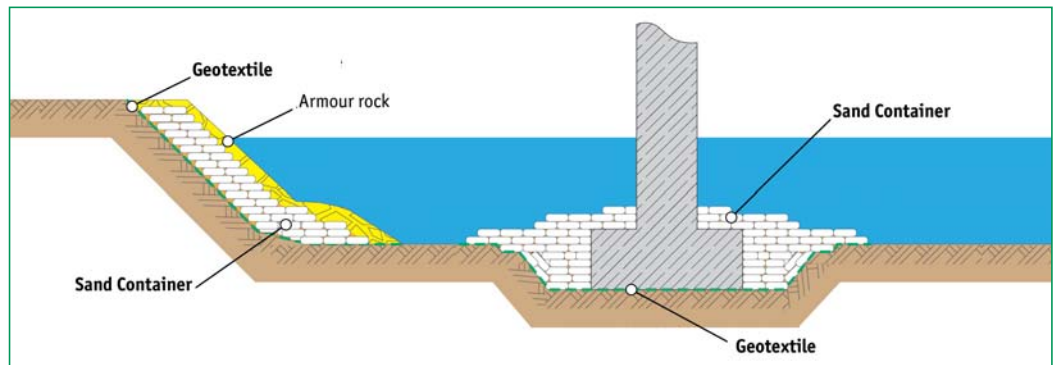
Scour protection with geotextiles and sand filled geotextile containers in a river application.
